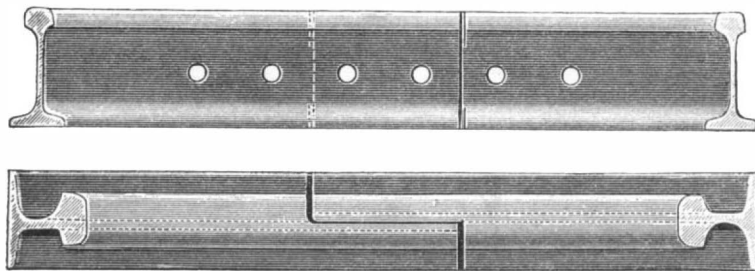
ALTERNATIVE WEB-LAPPED JOINT. LONGITUDINAL VIEW.
